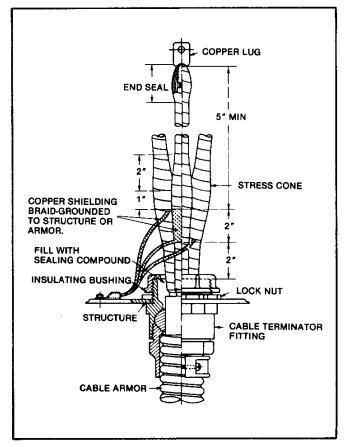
Termination of interlocked-armor, shielded, 5000-volt cable.
